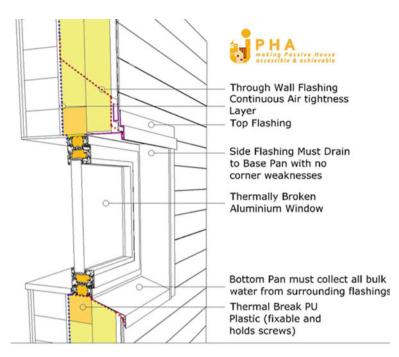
Passive House detail of window installation (provided by the Passive House Academy)
